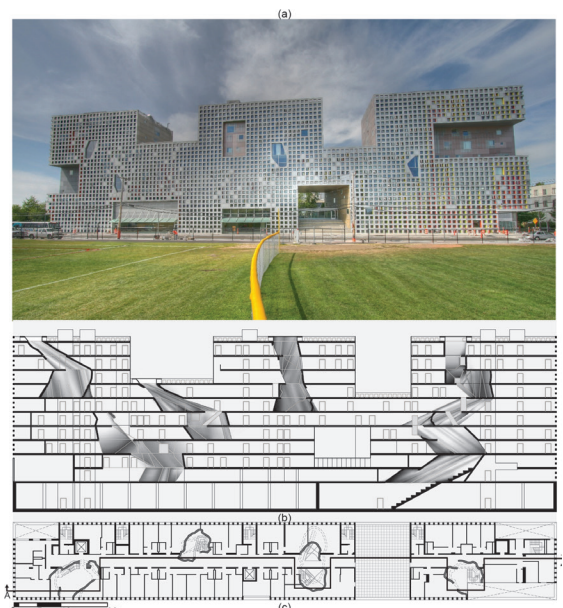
Simmons Hall, Cambridge, Massachusetts. (a) External view <<https://commons.wikimedia.org/>> (accessed 2021, February 20); (b) Section A-A'; (c) Seventh floor plan.
